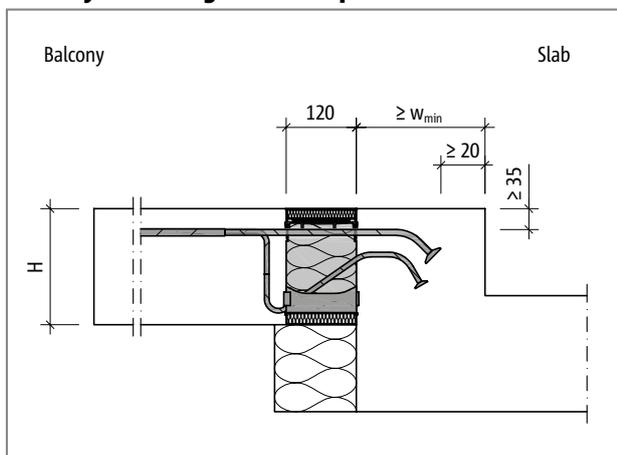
Schöck Isokorb® XT type K-O: Balcony with height offset upwards and external insulation
